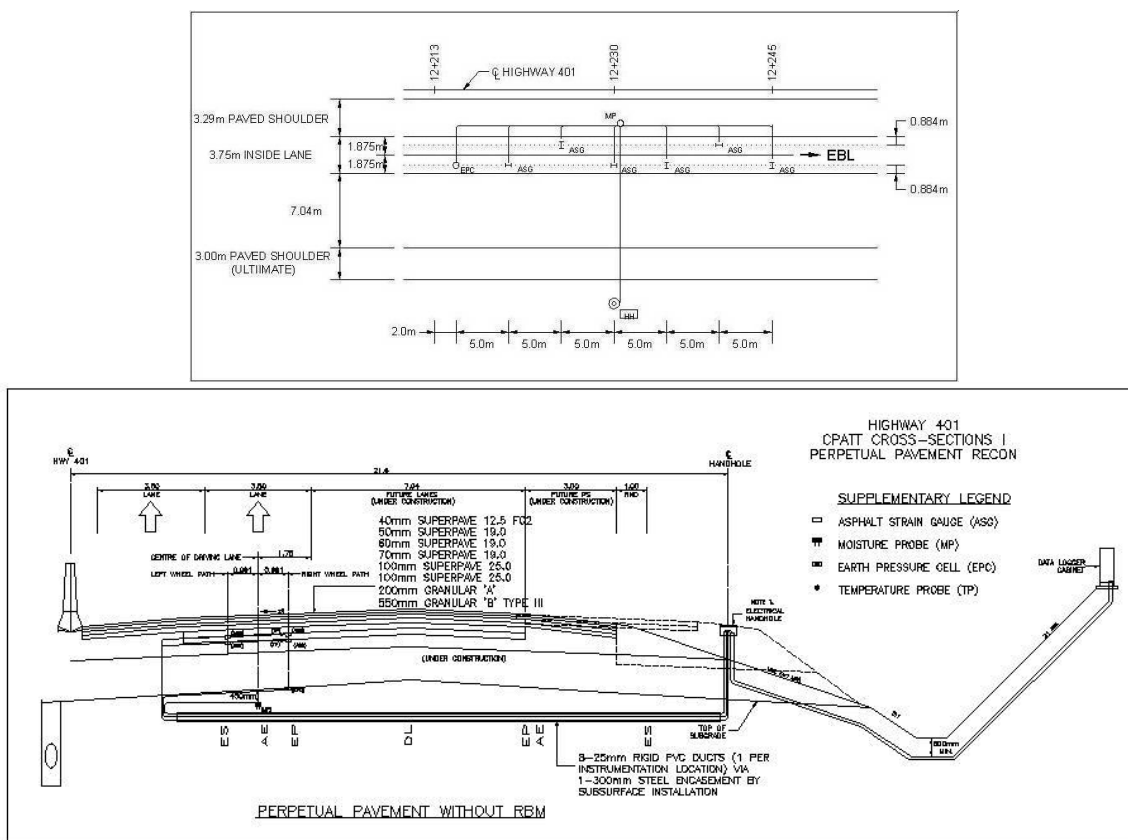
Plan and Cross-Section for the Perpetual Pavement Section without RBM
